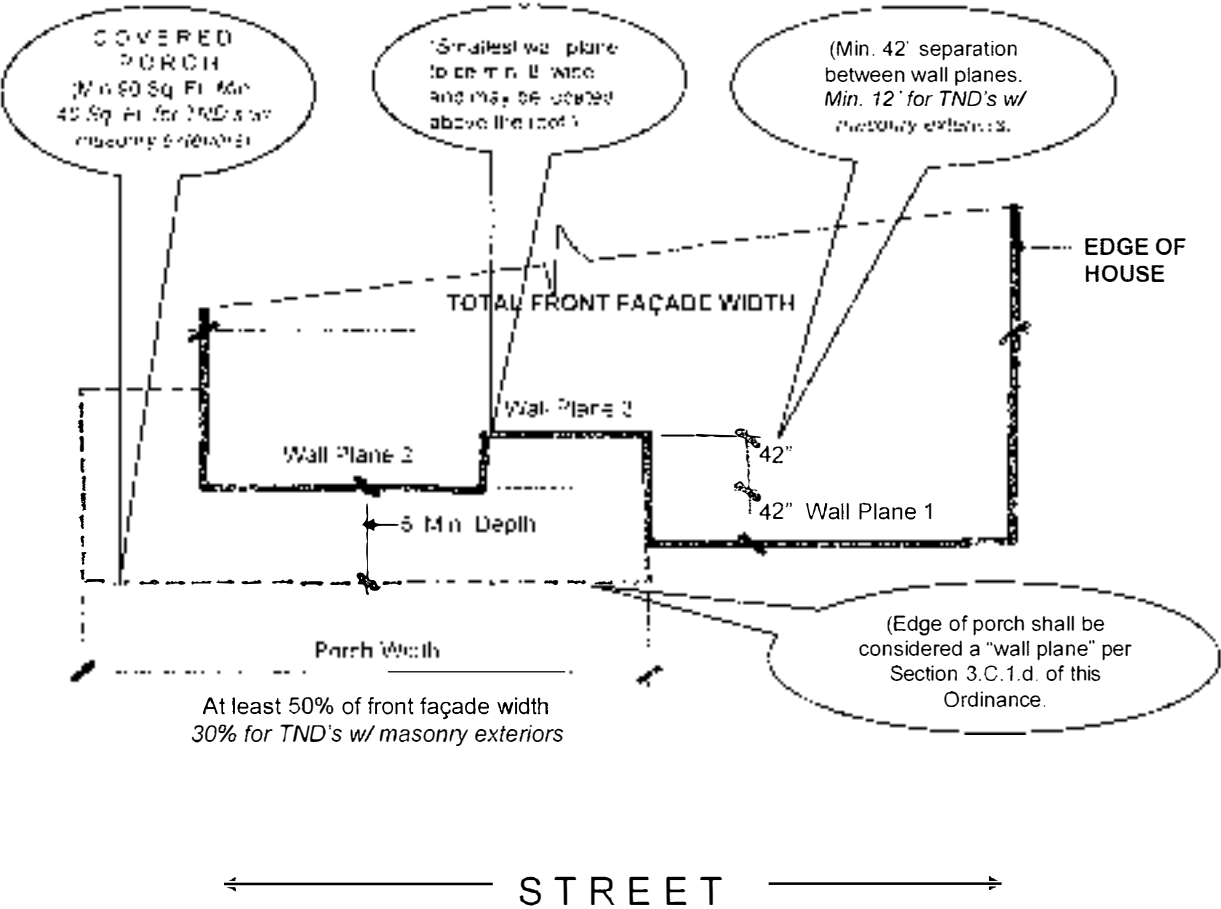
Hypothetical façade plan for residences styled with a historic architectural theme.
